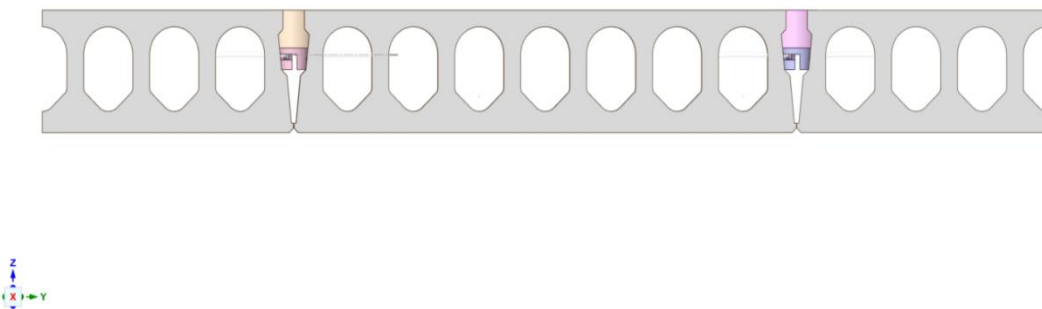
Section view of the finite element model highlighting internal voids and joint detailing in the slab-to-slab connection.
